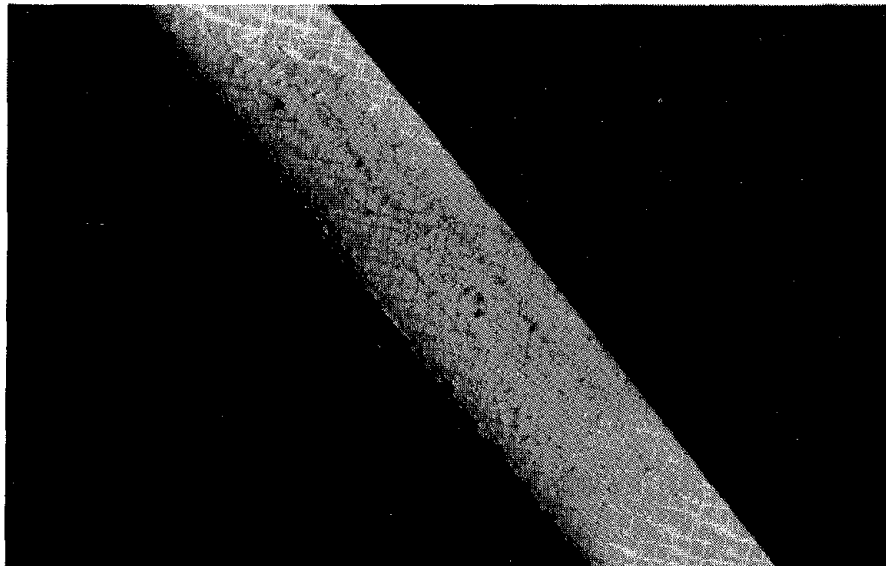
Photographs of Compression Buckling and Tension Yielding of Pipe Diagonal Braces
